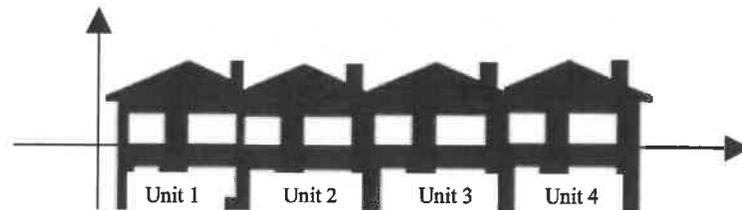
I: Linear Multi-Family Dwelling Arrangement
